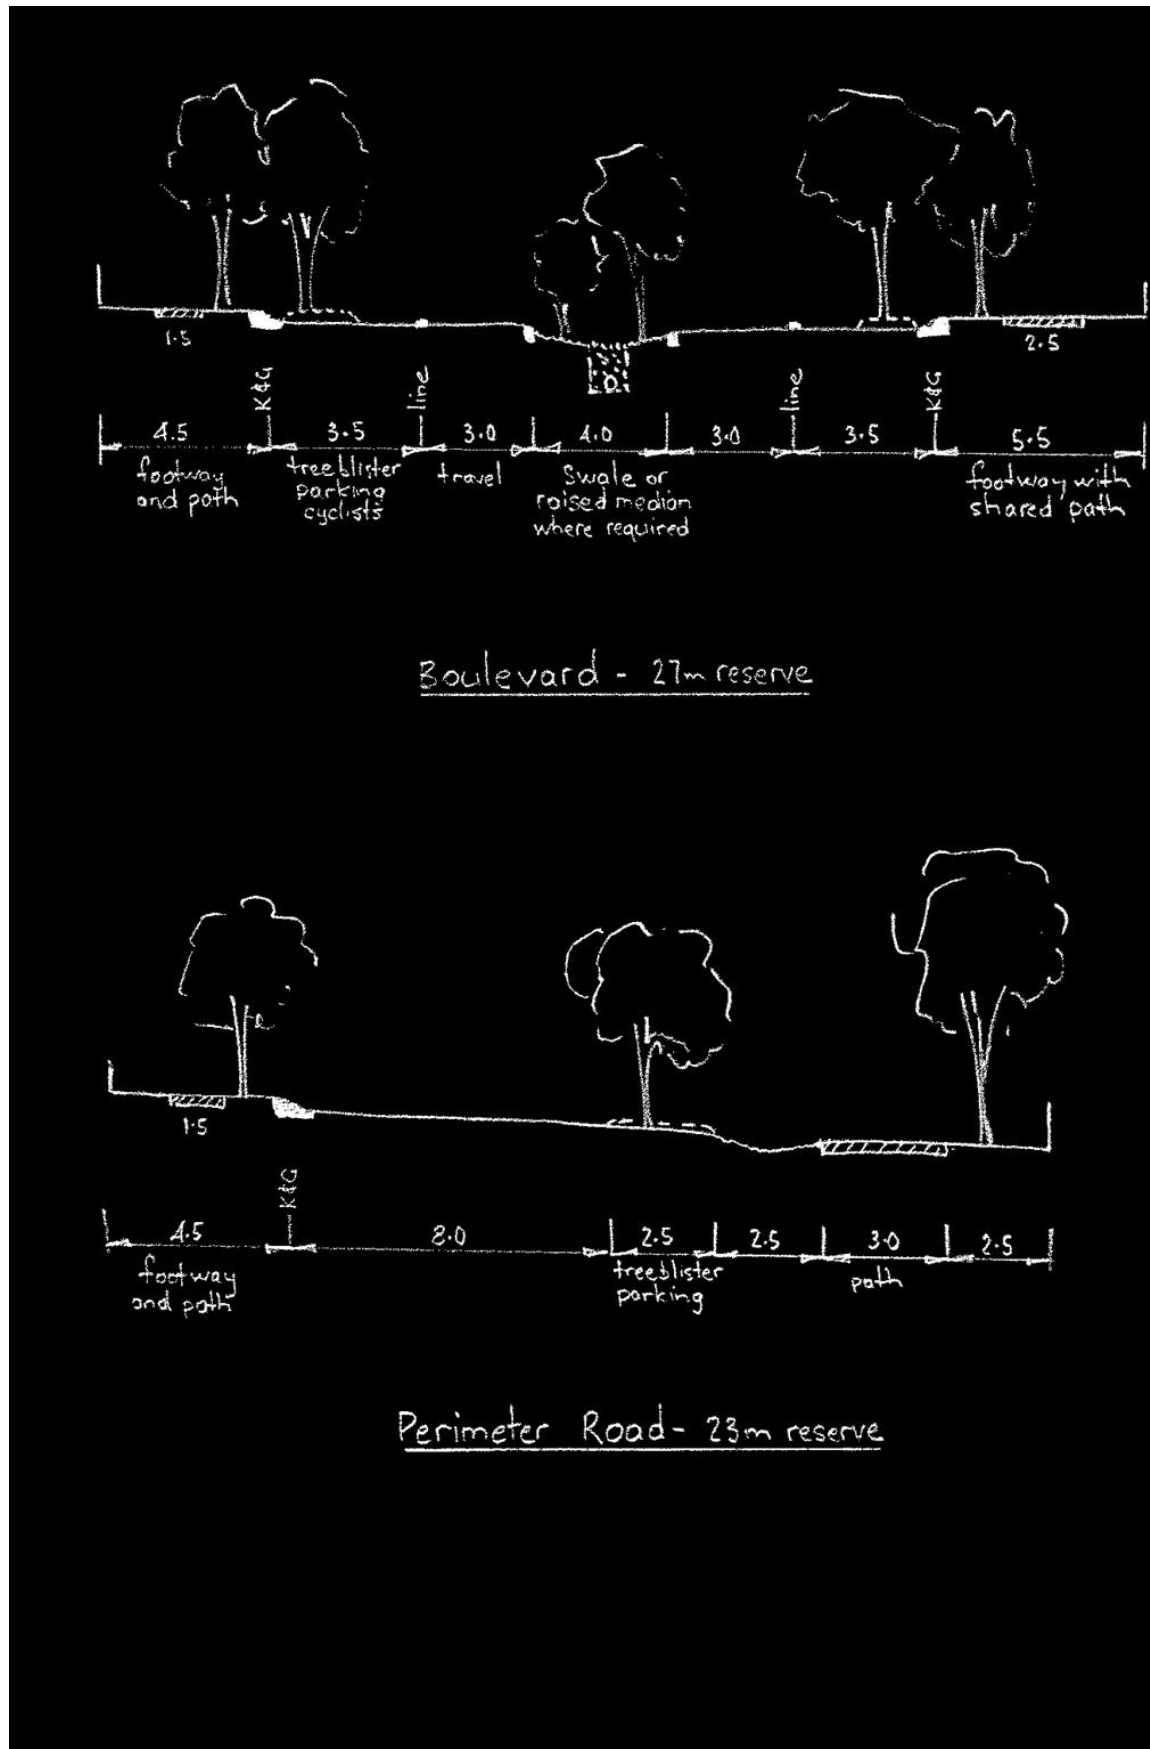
Thornton North - Typical cross-sections for WSUD drainage swales.
